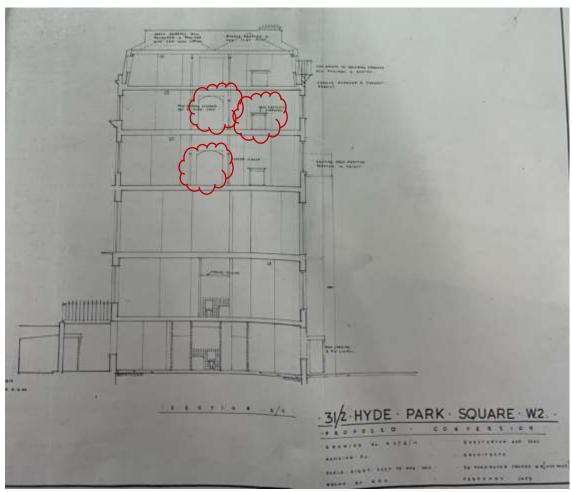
Section C-C – New openings in the party wall between Nos 31 and 32 Hyde park Square
